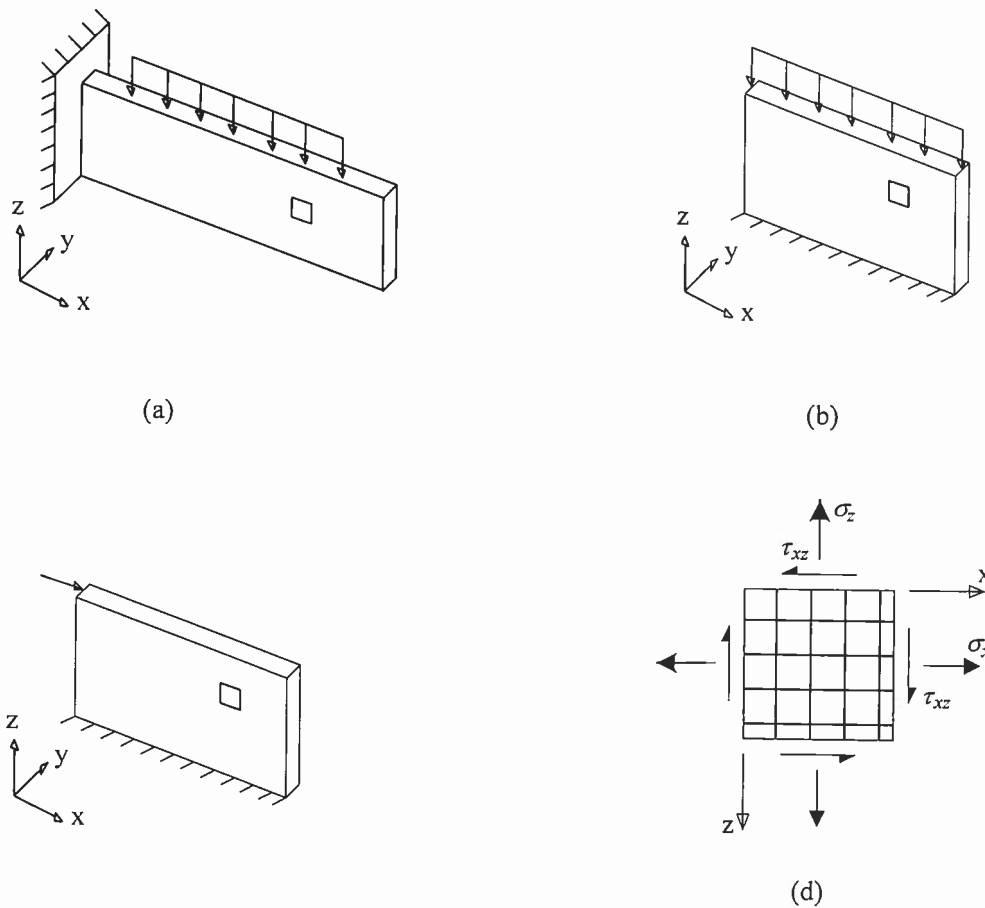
Structural elements subjected to in-plane forces: a) deep beam; b) load-bearing wall; c) shear wall; d) general case of plane stress state
